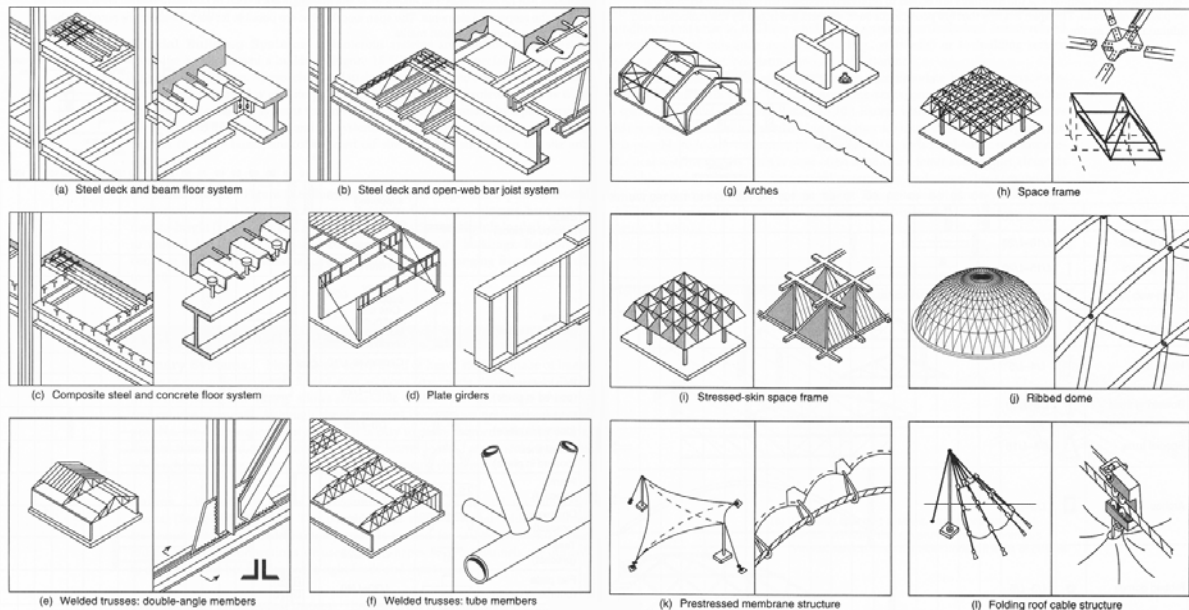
Types of Steel Construction. *Structures*, Schodek/Bechthold. Figure 15.7 pp496-7
